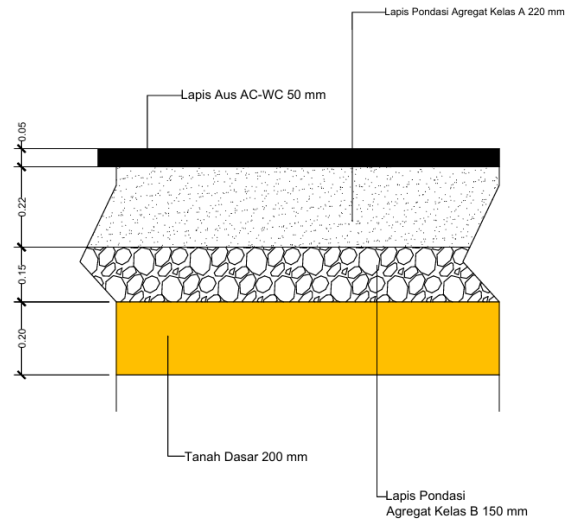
1 Longitudinal section of the flexible pavement of the inspection road
